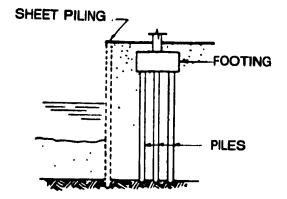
SCOUR PROTECTION USING SHEET PILING<sup>2</sup>
